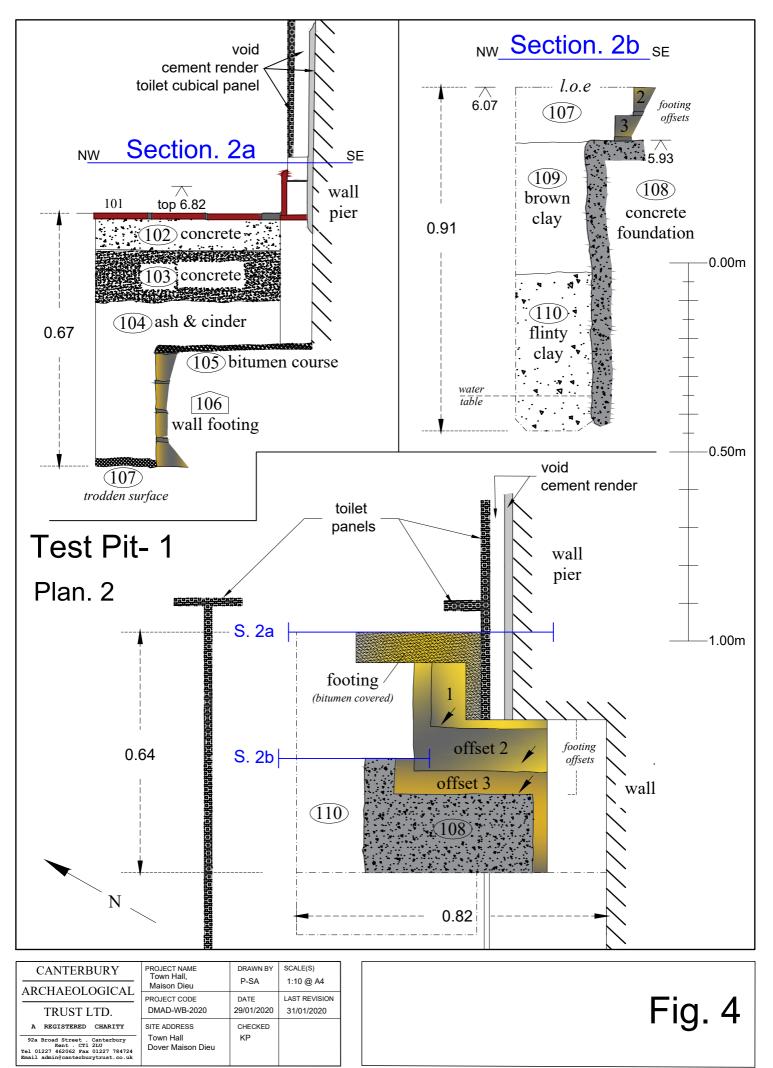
Plan and section through recorded deposits, Test Pit 1
